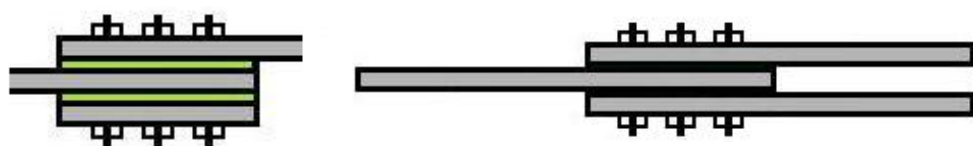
Possible arrangements of steel plates in friction dampers.
